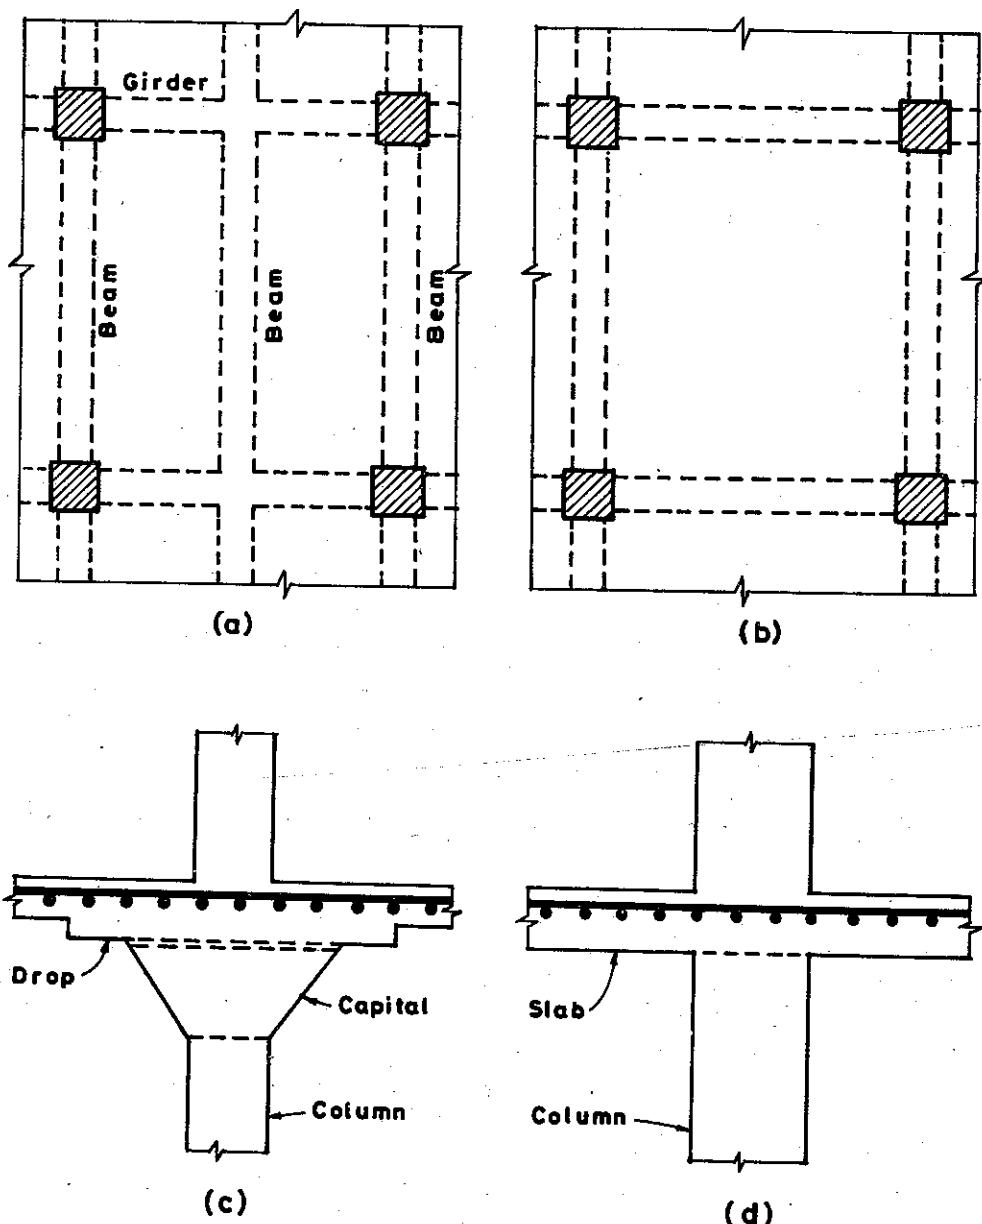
Types of reinforced concrete slabs: (a) One-way slab; (b) Two-way slab; (c) Flat slab; (d) Flat plate.
